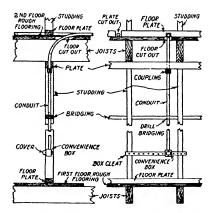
Method of Installing Conduit to Convenience Outlets or Switch Boxes
